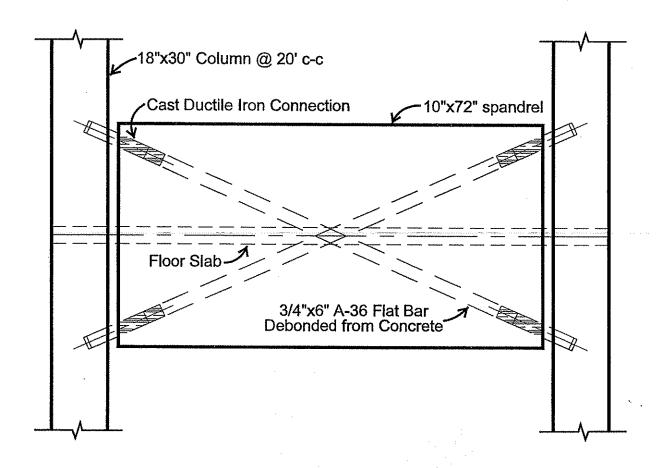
Mast's Precast Seismic System (Adapted from Ref. [1-5])
